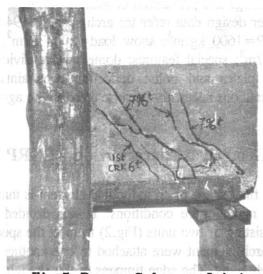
Beam Column Joint Specimen After Test To Failure
